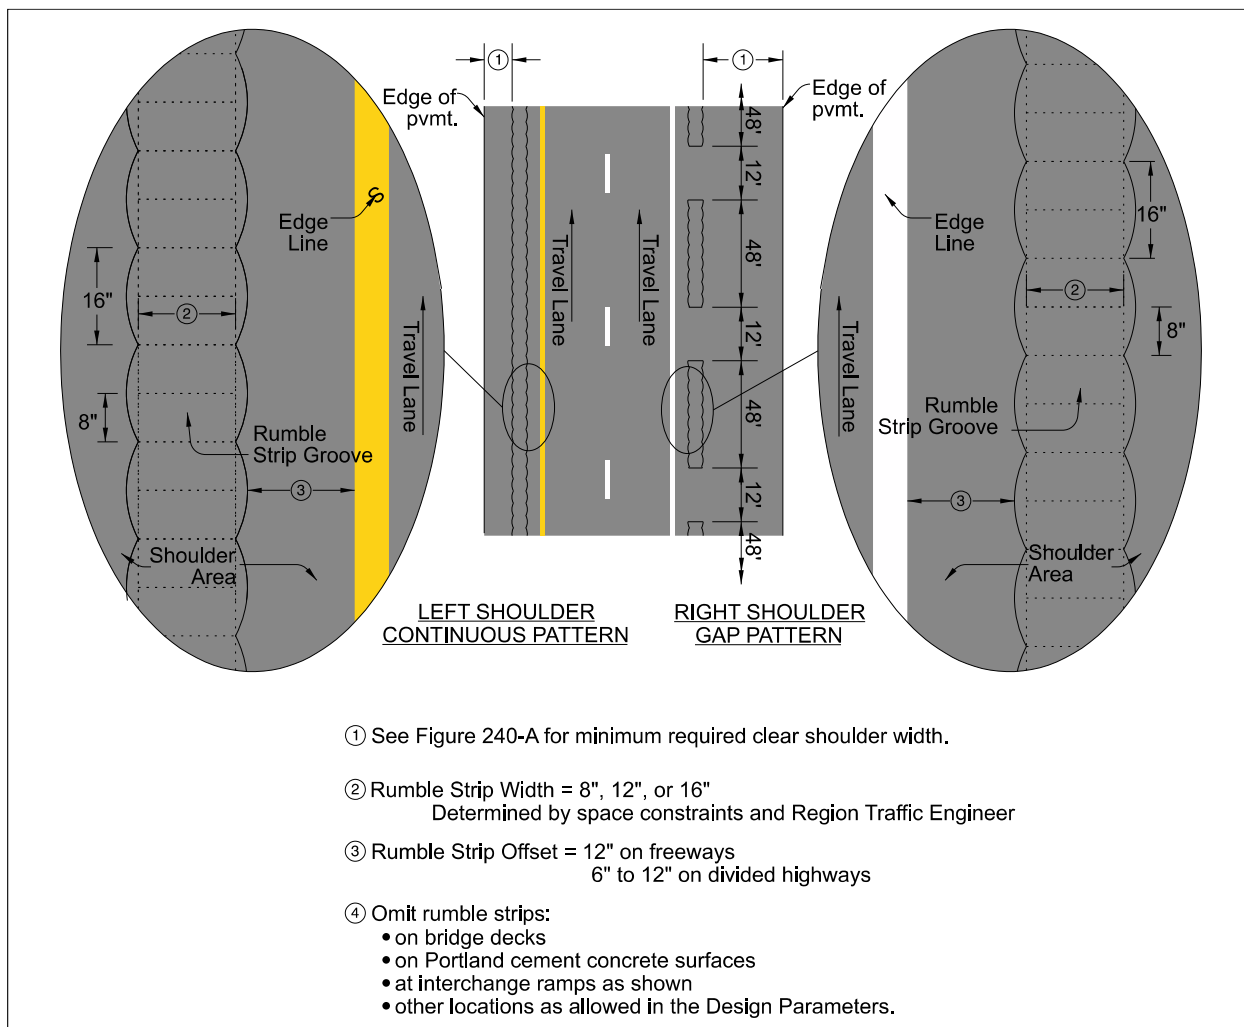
B: Typical Shoulder Rectangular Rumble Strip Placement on Rural Freeway or Divided Highway
